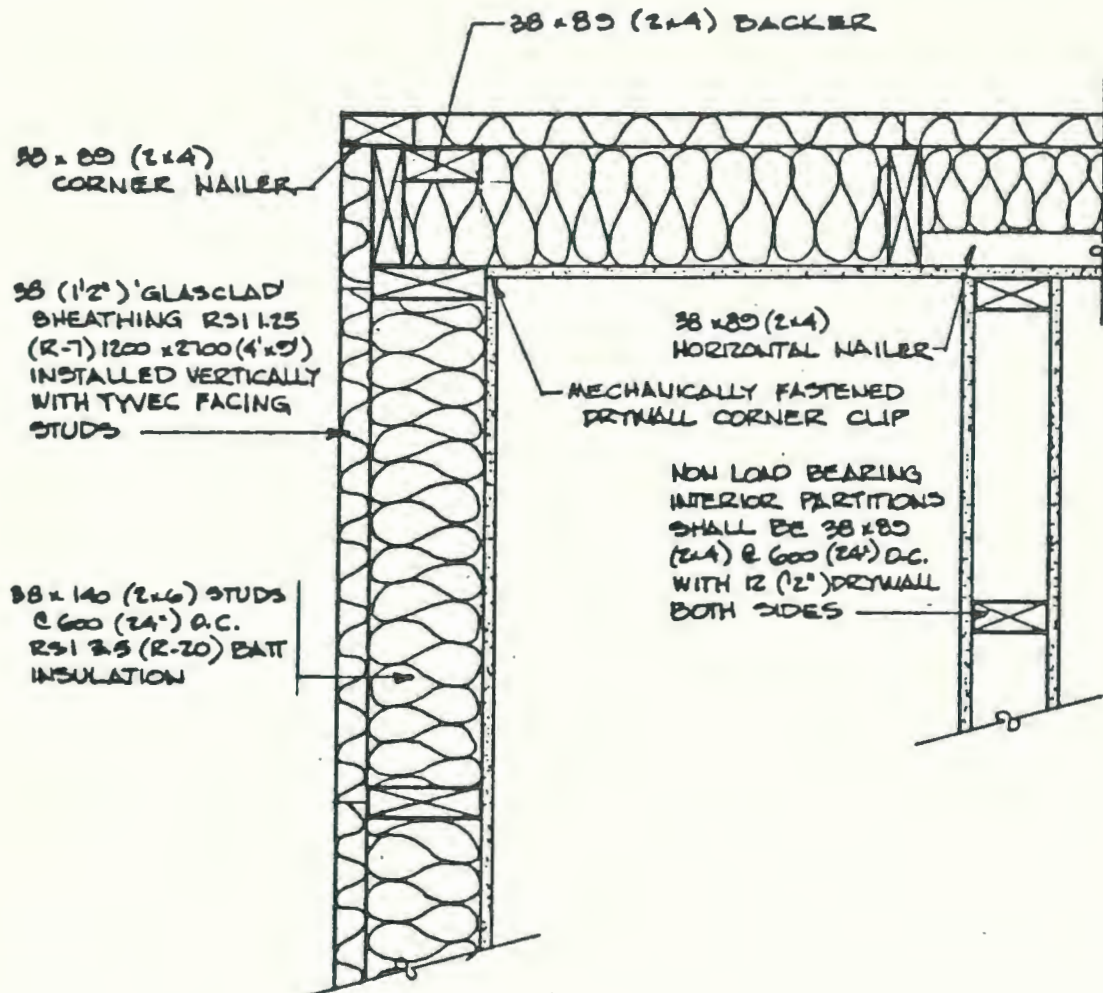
Corner Framing Details - Alberta Demonstration Project
